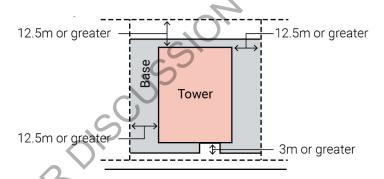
a. Setbacks for point tower high-rise buildings located mid-block.
